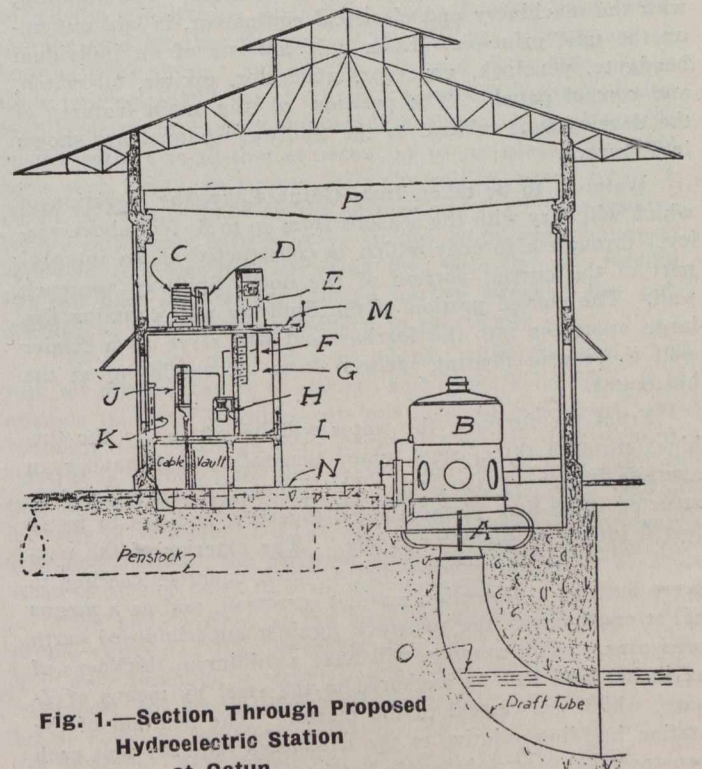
Section Through Proposed Hydroelectric Station at Gatun.
